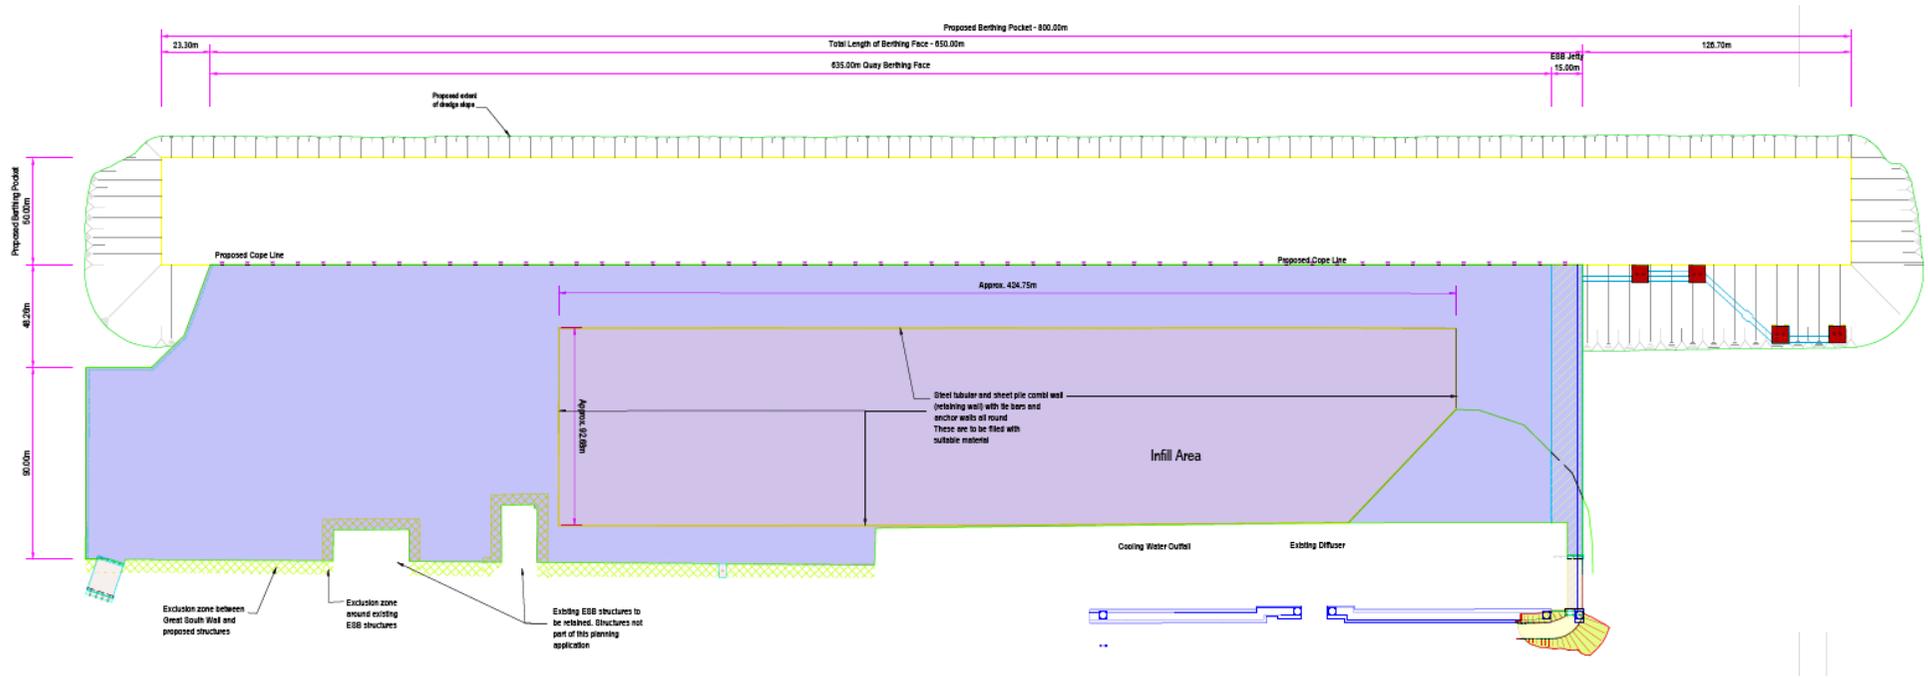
Proposed layout for the New South Bank Container Terminal and NORA Oil berth
